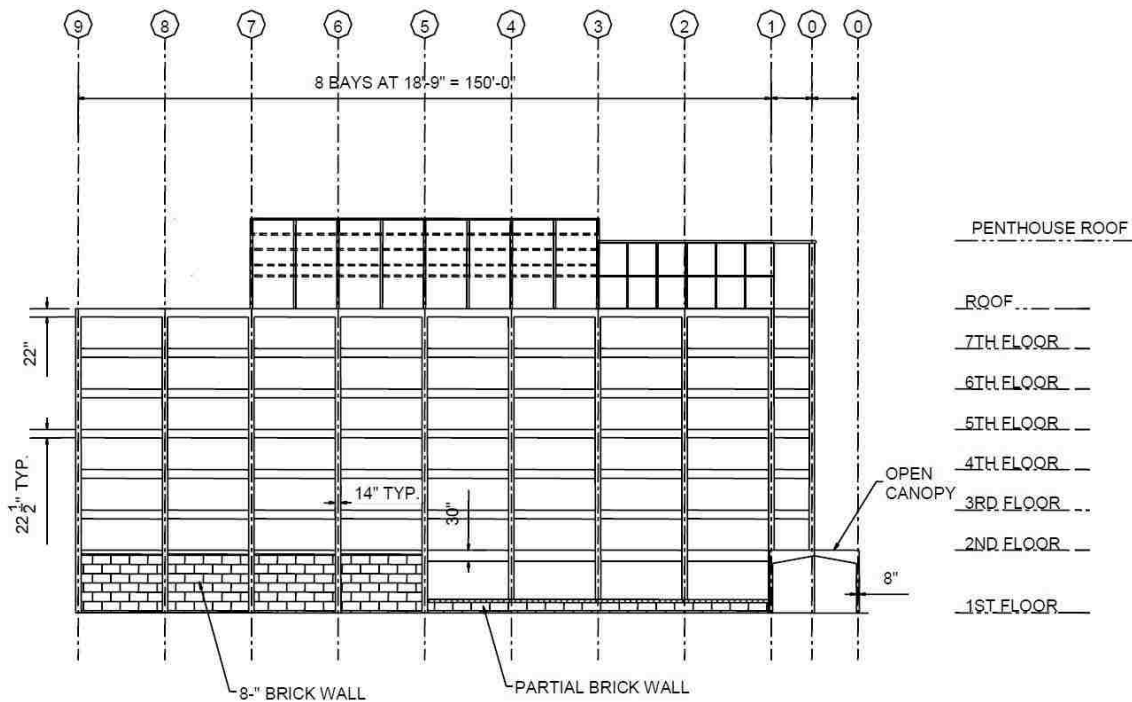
Van Nuys building elevation (Paspuleti 2002)
